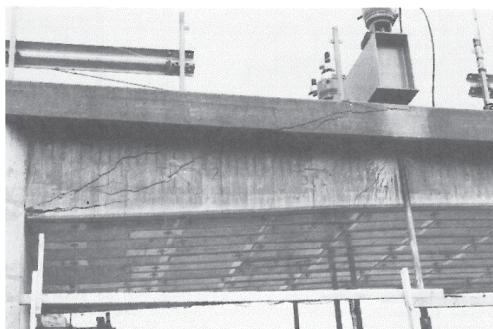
The Stora Höga Bridge 1 after shear failure between the applied load and supporting wall (Plos & Gylltoft 1995)
